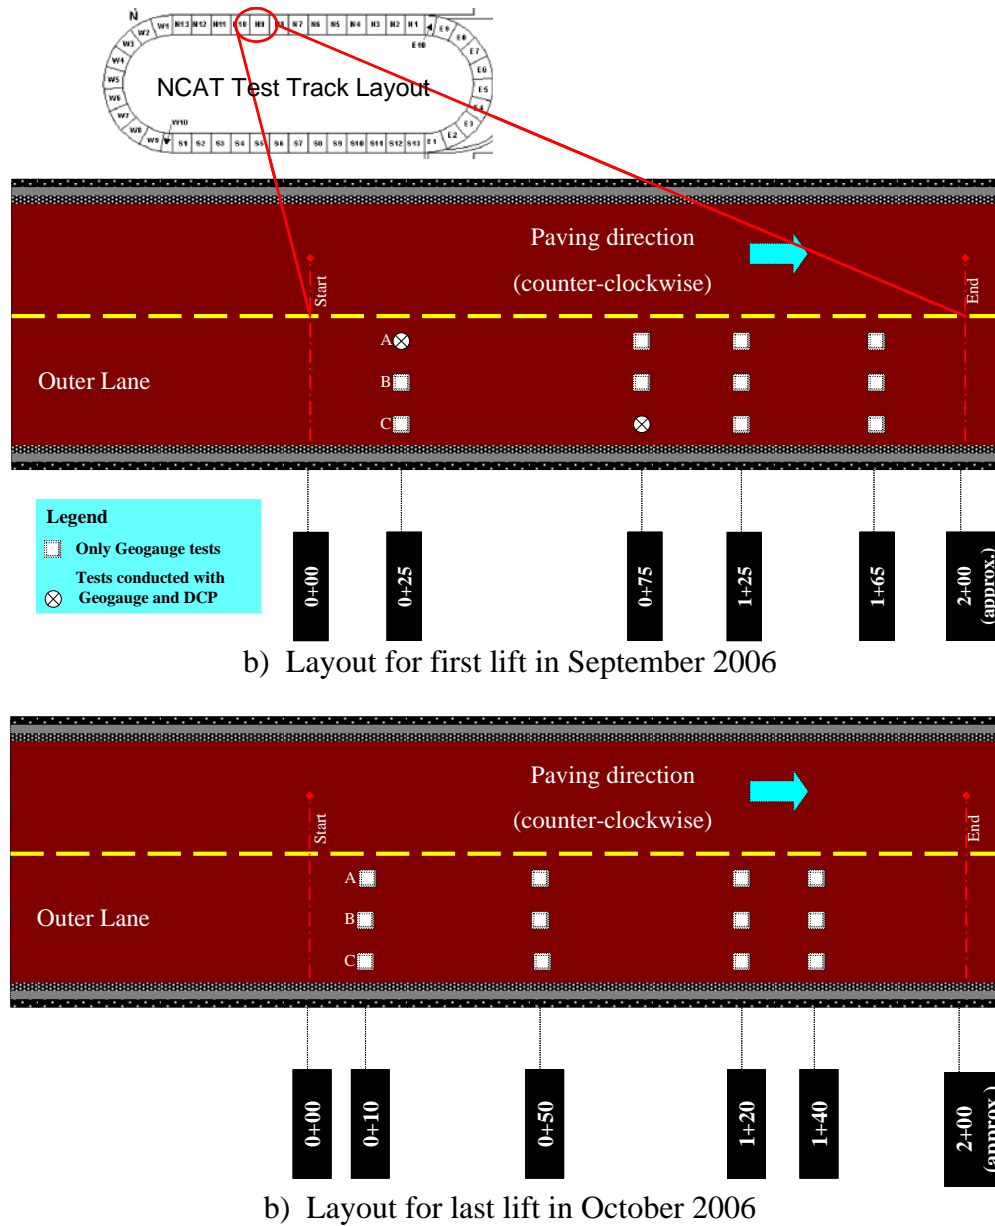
Layout of Test Points on Subgrade Section N-9 at NCAT (refer to Tables B.14 and B.15)
